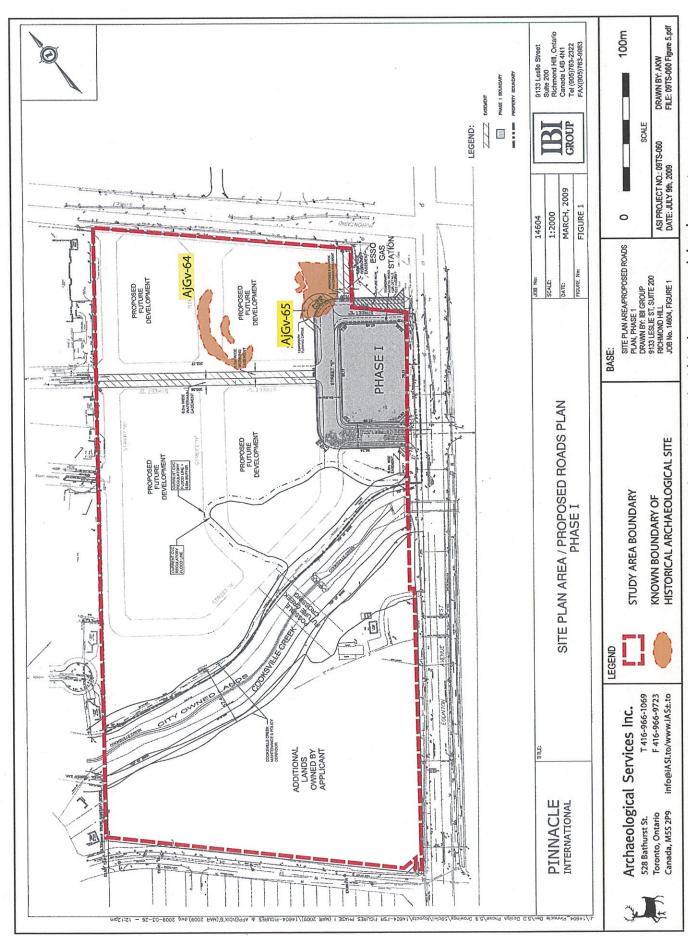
Location of the Winter North site (AjGv-64) and the Winter South site (AjGv-65) within the proposed development
